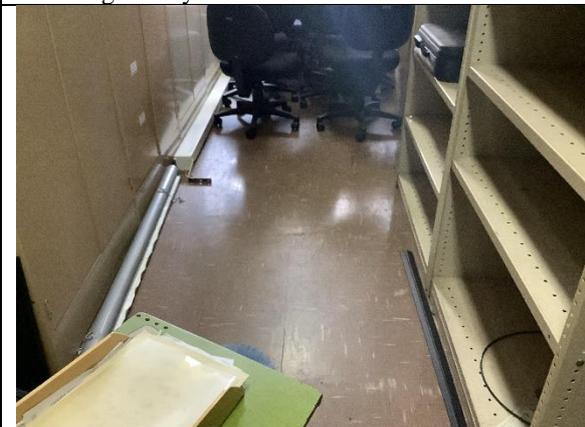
Building C – C.1.4 - Throughout – Floor Covering – Vinyl Tiles - Brown
